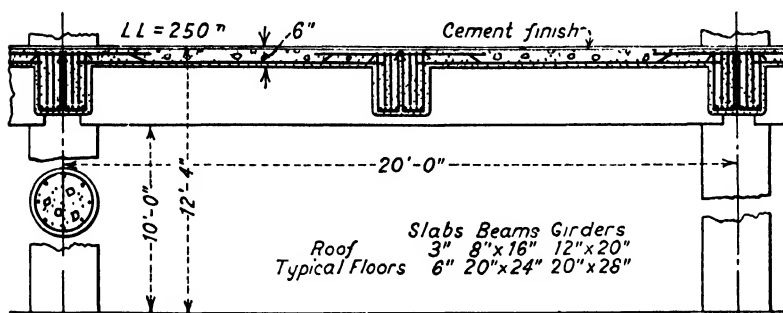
Type 2. Beam and Girder Floor for 8-Story Warehouse. (See p. 786.)
